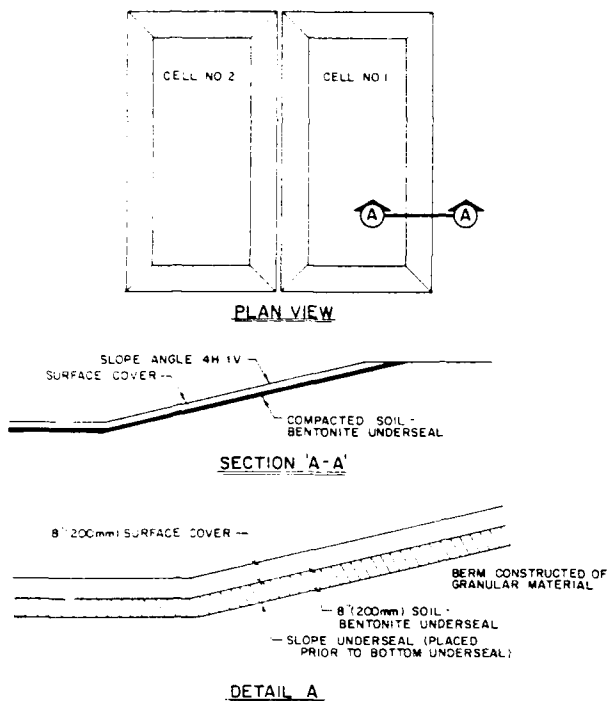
PLAN AND SECTION VIEW OF FINAL LINER DESIGN
